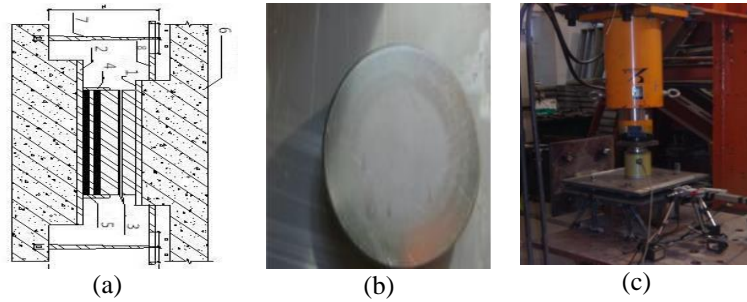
Design and loading test of sliding isolation bearing ((a) Bearing structure (1. Upper plate; 2. Lower plate; 3. MoS₂ layer; 4. Rubber; 6. Base beam; 7. Displacement controller; 8. Guide plate); (b)Slider; (c) Loading device)
